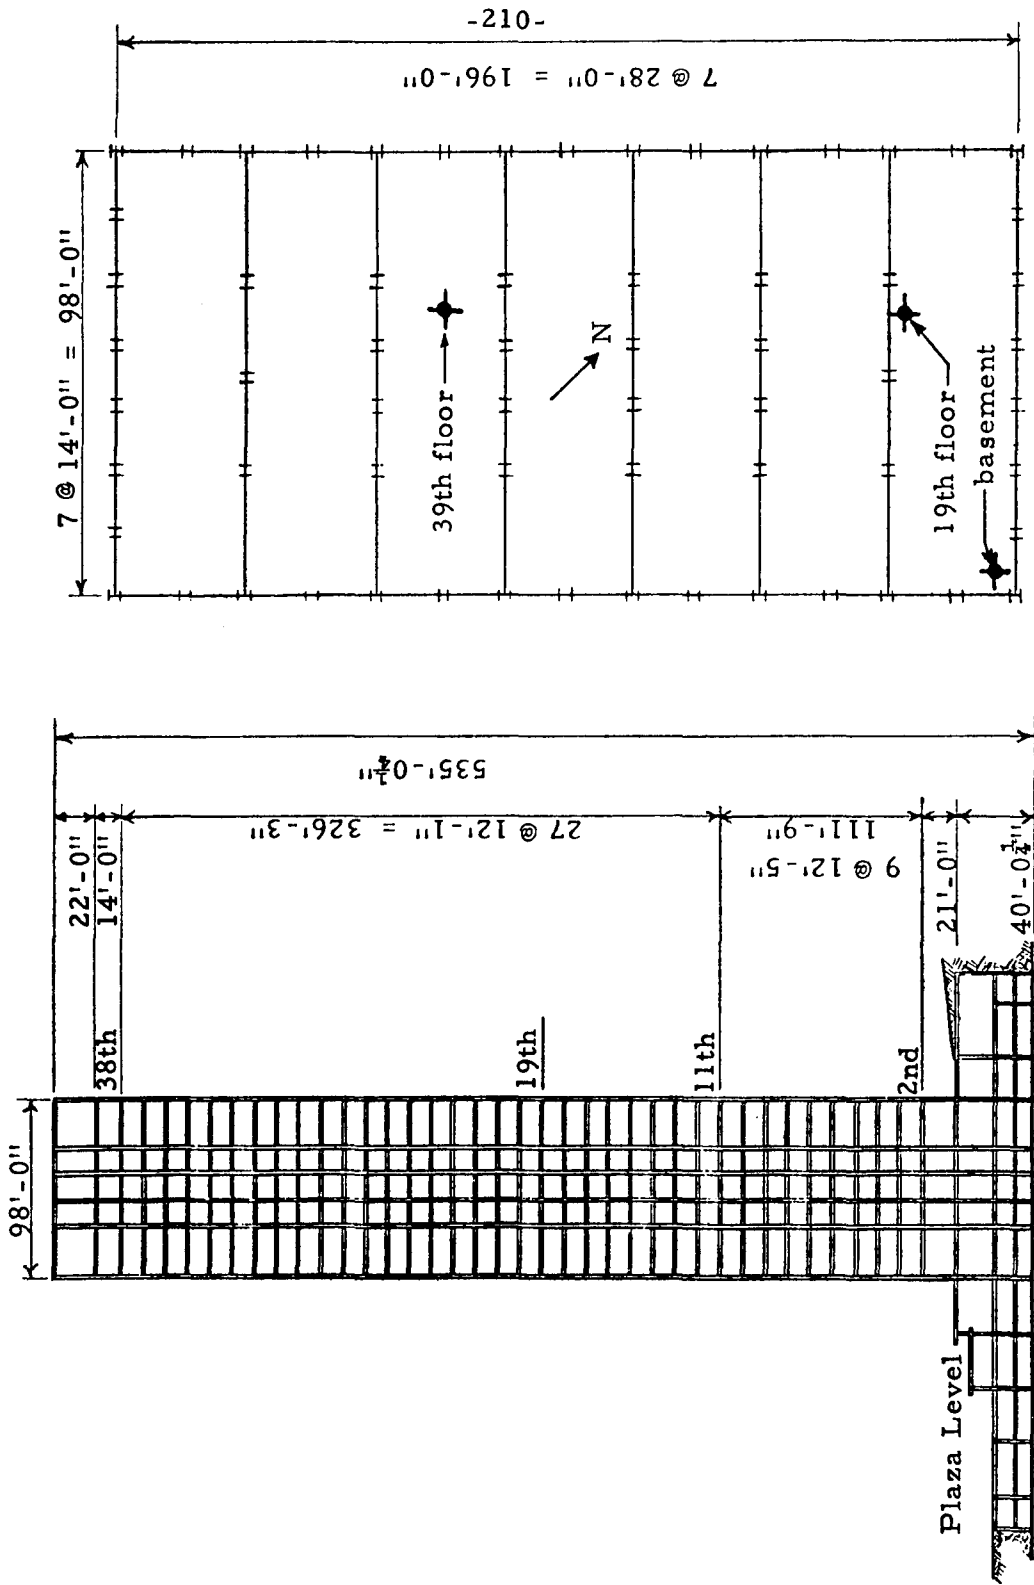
Transverse section and typical floor plan of Union Bank building. ◆ — Location of accelerometer. (from A.C.Martin and Associates, 1973)
